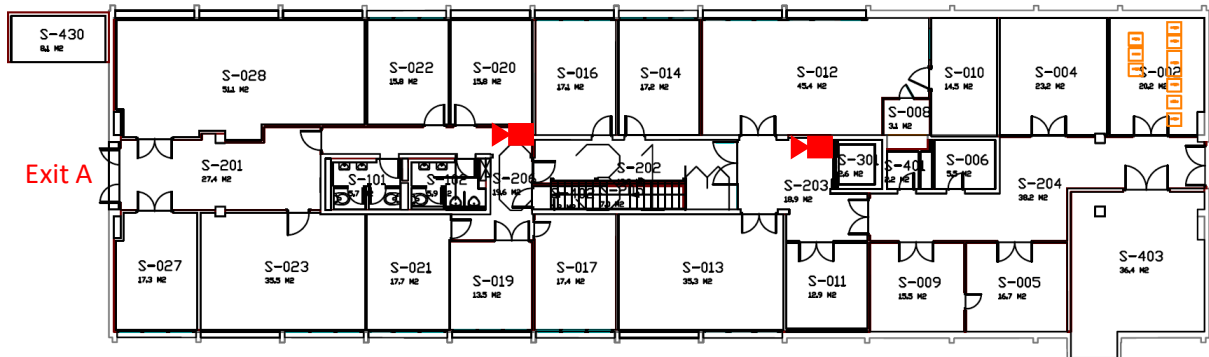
floor R-1 layout, the locations and orientations of cameras, and the locations of emergency exits within this floor – building 1
